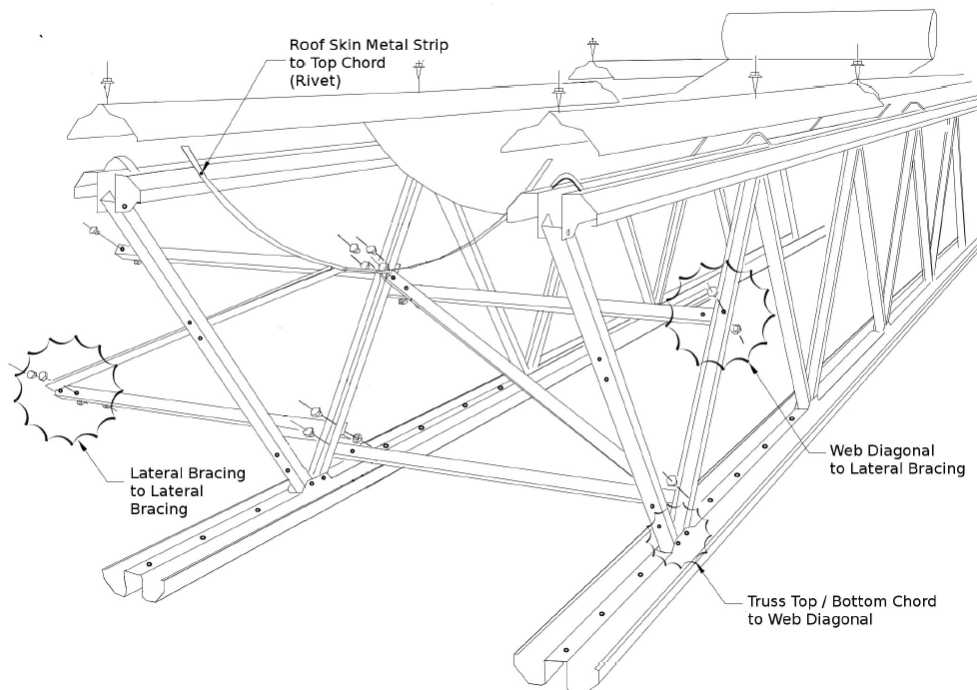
ISOMETRIC VIEW OF TRUSS CONNECTIONS
